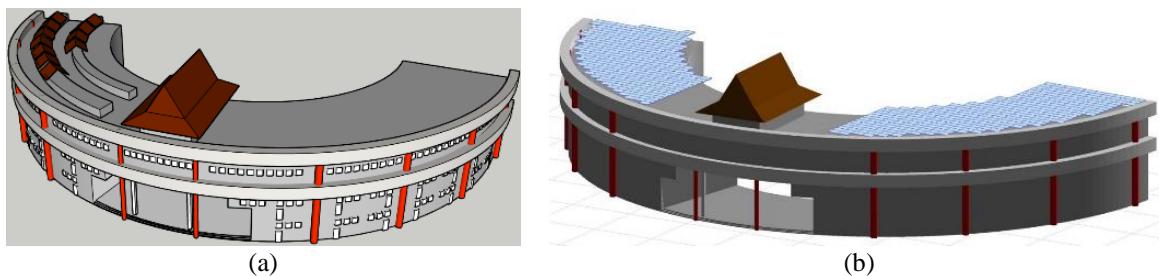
The 3DS and RPV system design of academic building, Building C, Faculty of Engineering, University of Riau: (a) the 3DS design of building and (b) designing an RPV system
